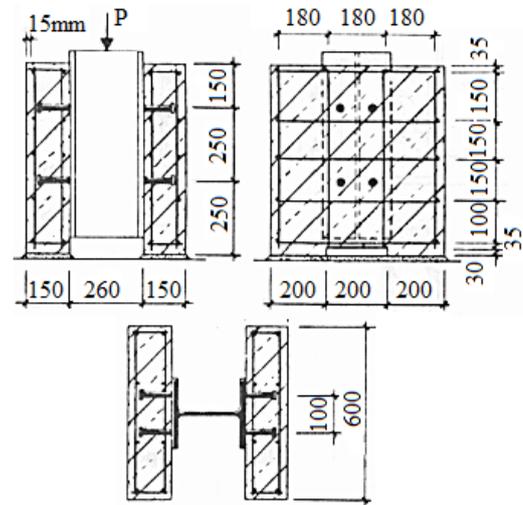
Shear test samples for steel and concrete (units in mm) by Eurocode 4:1994 Standard Code [10]
